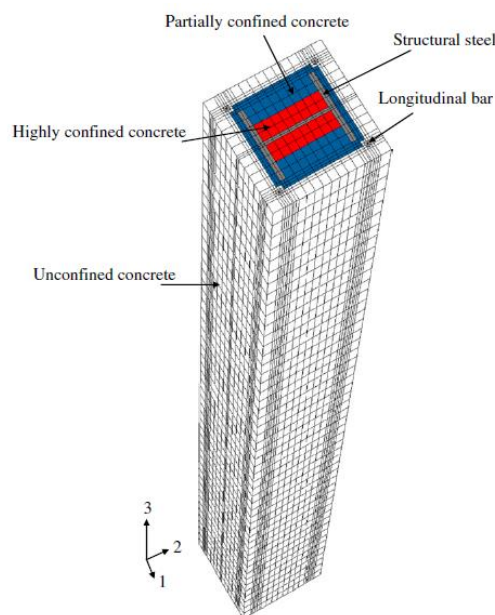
7 - Finite element model of concrete encased steel composite columns (Ellobody and Young, 2010).
